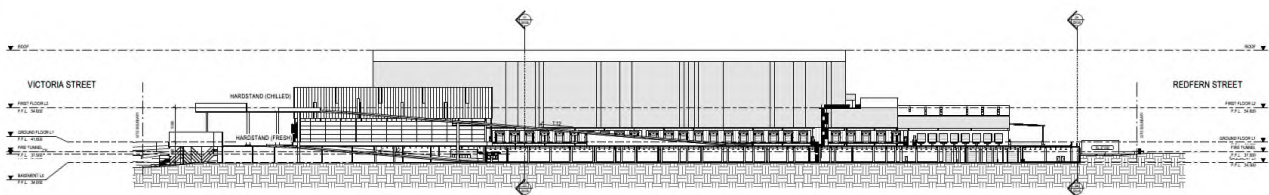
Long section illustrating suspended hardstands and associated concrete structure.
